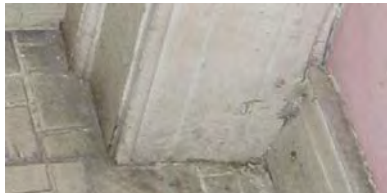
Door D108 case molding type-4 photo and profile. (Photo: BBB, 2006)
